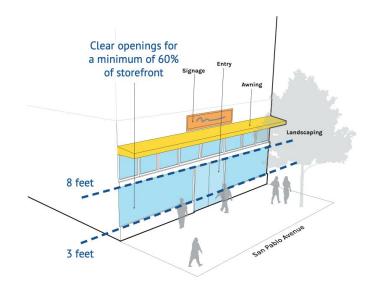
STREET FRONTAGE ON SAN PABLO AVENUE
